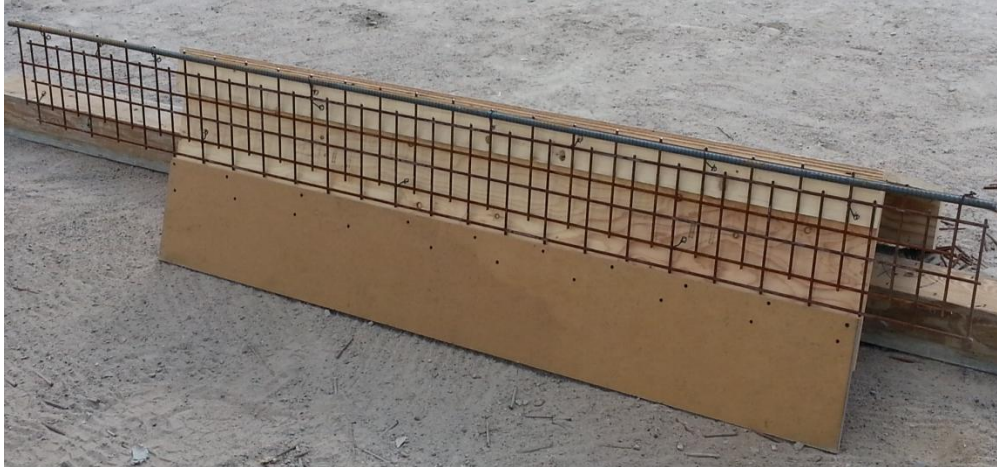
Welded Wire Fabric Shear Reinforcement
